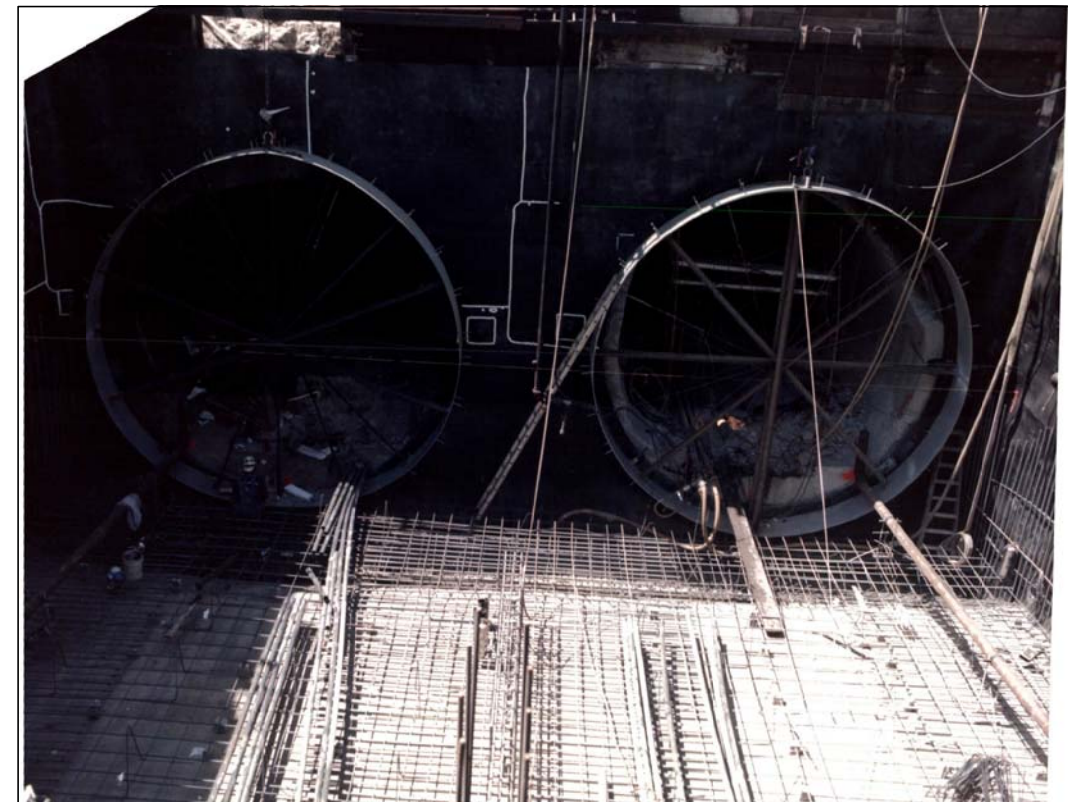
Reinforcement steel being placed in the closing slab of box structure at the south tunnel portals. Photo taken: 07/30/90. Source: SCRTD, 1990a.
